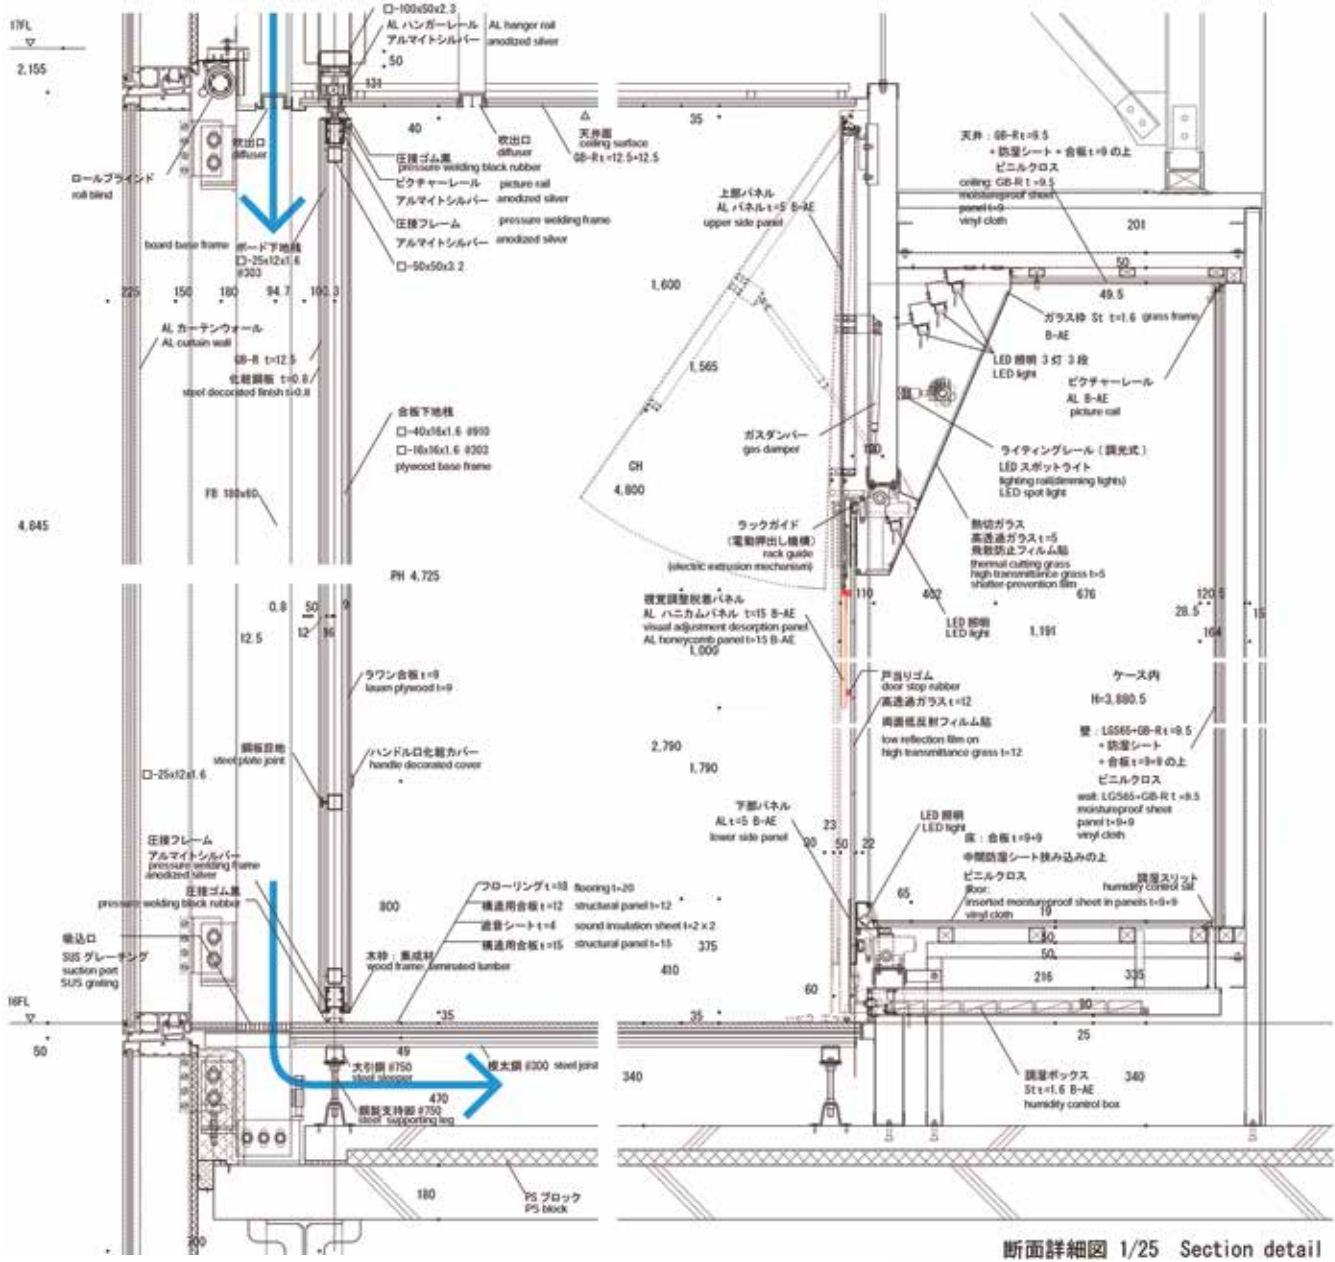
Curtain wall of the office spaces showing airflow direction. Source: Shinkenchiuku-sha Co. Ltd.
